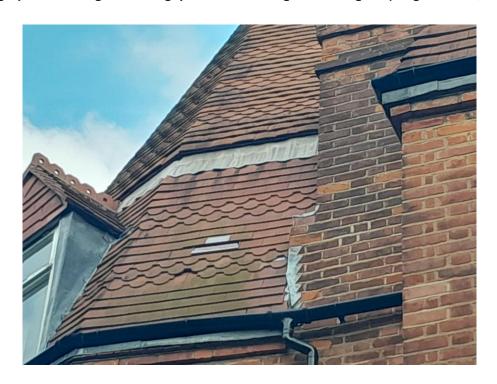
Missing tiles on building B2 (Target Note 1, Figure 1)
